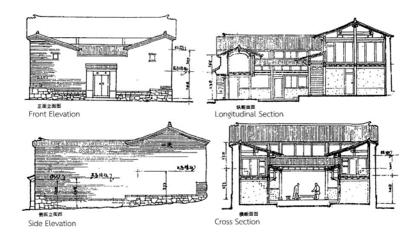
The Elevations and Sections of Yikeyin Source: Liu, and Liu (1996)
